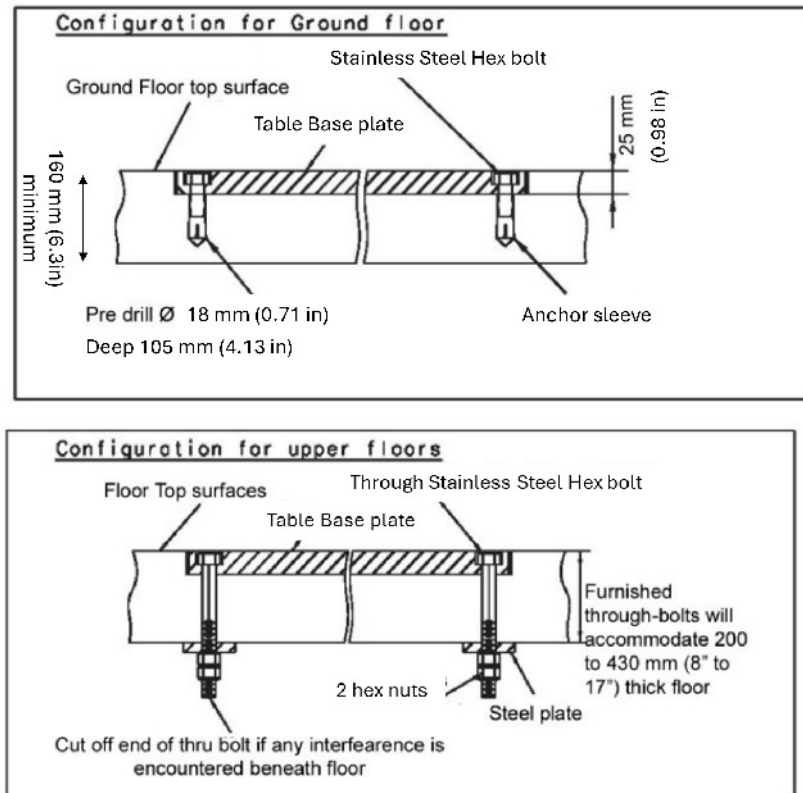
Through-Bolt Supplied (Pan Type Floor Construction)
